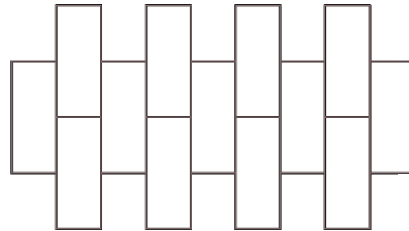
The designed joint formwork on Rhinoceros 3D
